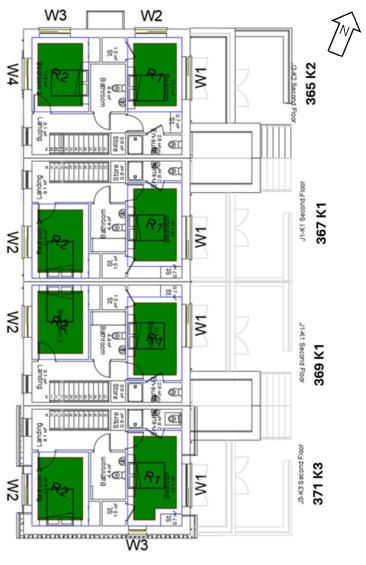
Apartment 369-367 K1, 365 K2 & 371 K3 Second Floor sDA Contours
